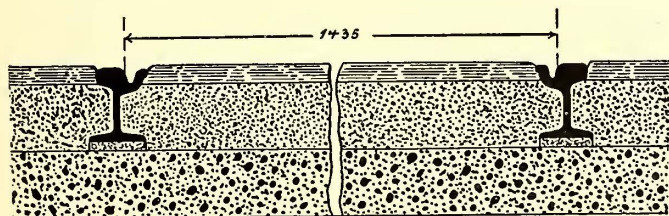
TRACK CONSTRUCTION IN ASPHALT
